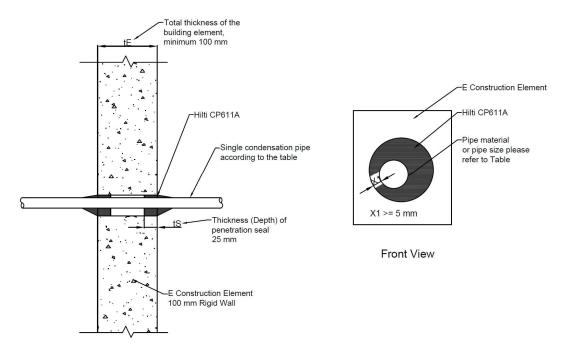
Condensation pipe penetrating minimum 100 mm thick rigid wall
